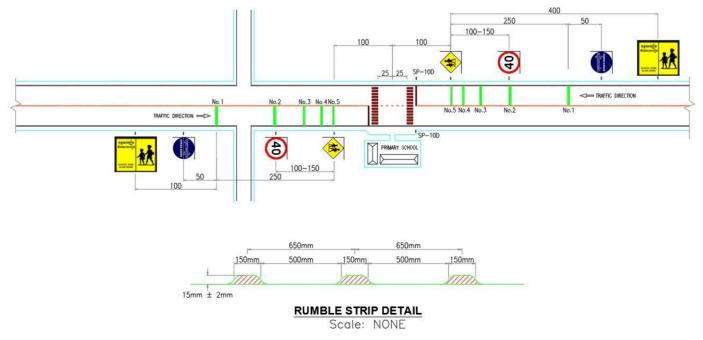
Minimum TSDs Layout for 4 legs intersection School zone with rumble strip detail
